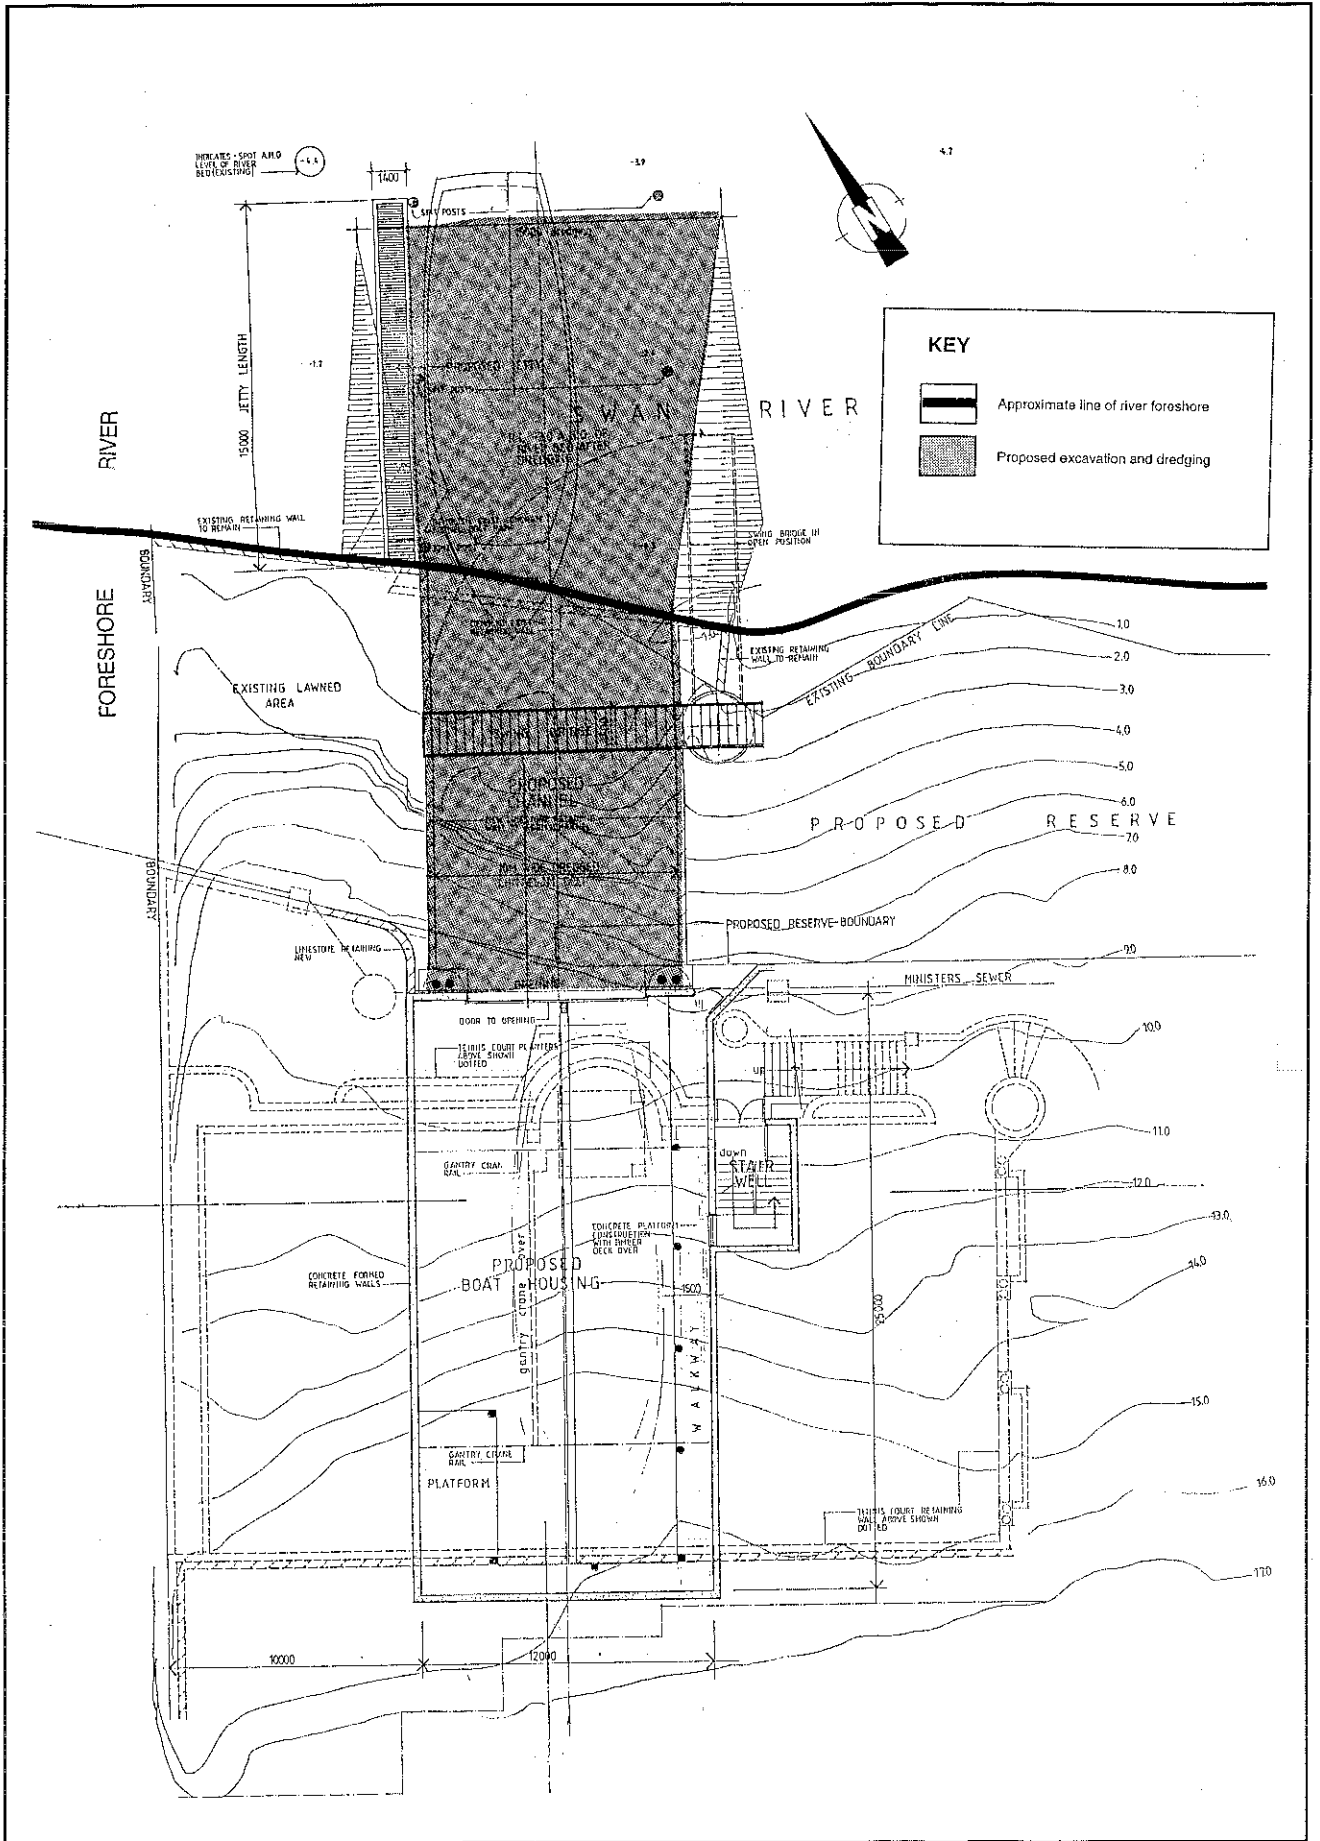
Site plan of proposed development (Halpern Glick Maunsell, 1994).
